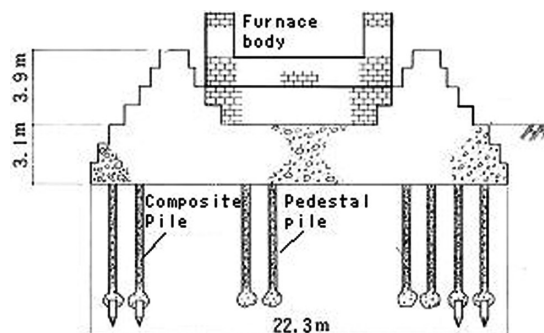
Sectional view of foundation for Kukioka No. 1 Blast Furnace, Yawata
